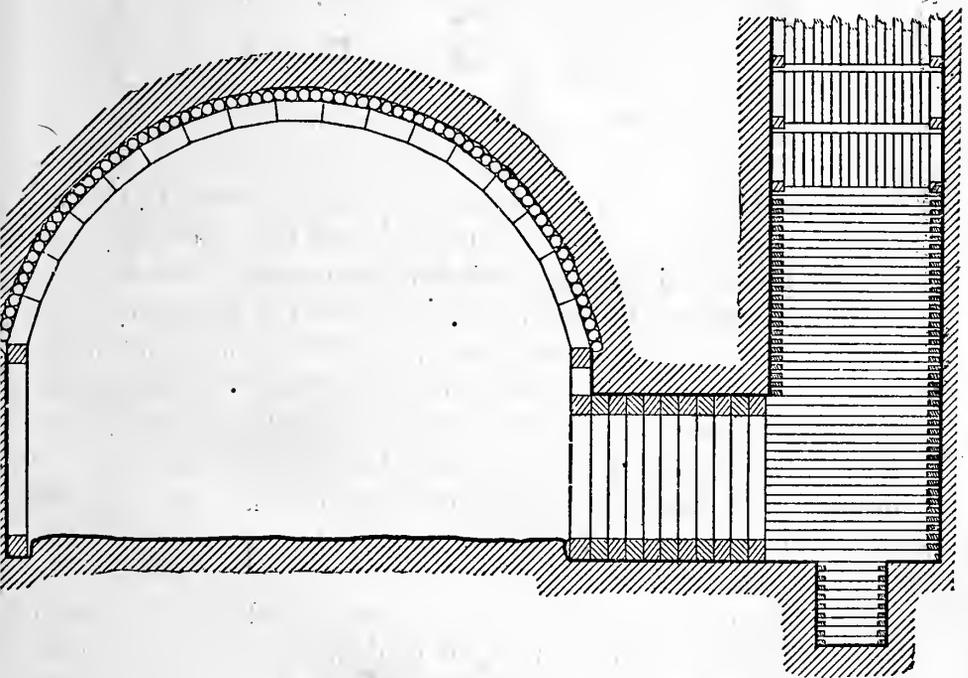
CONNECTION WITH SHAFT, CHURCH HILL TUNNEL.
